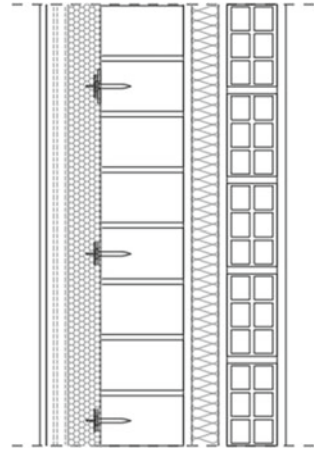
ETICS façade type section with EPS thermal insulation
